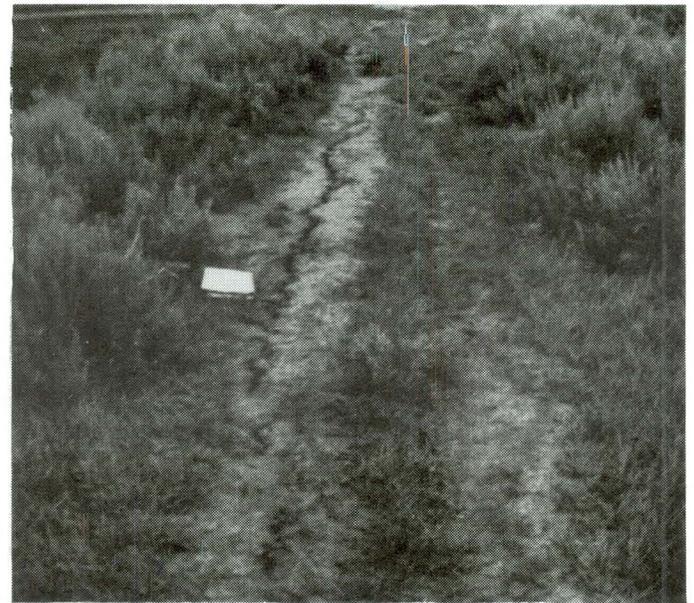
LONGITUDINAL DRYING CRACKS ON THE CREST OF A DAM. These cracks are caused by drying of the crest surface and are only 6-8 inches deep.
